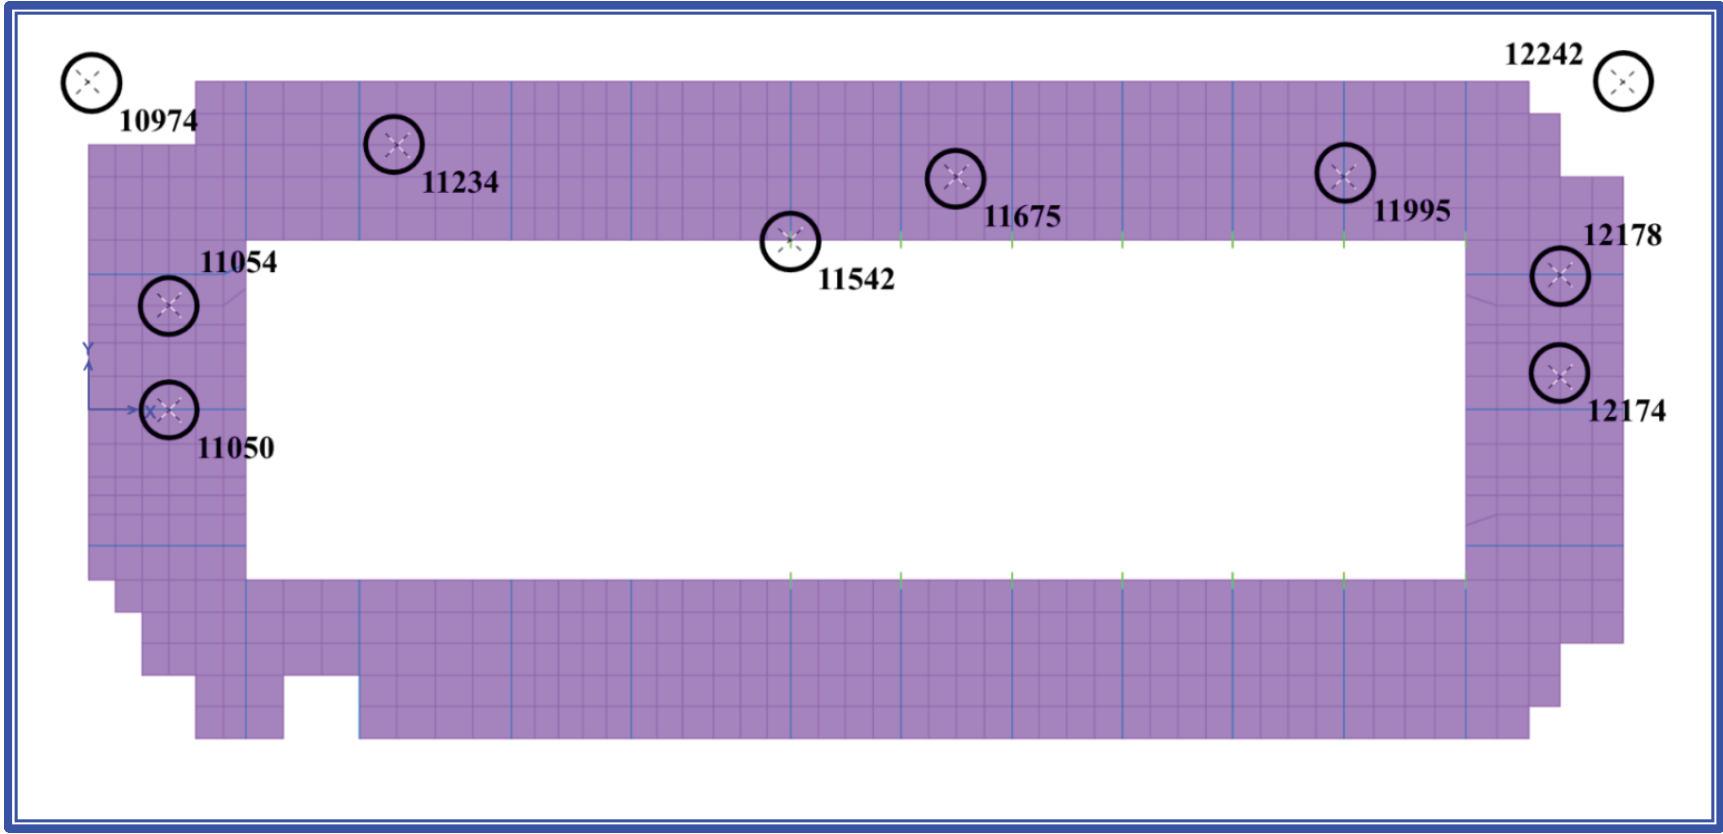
Floor ISRS Locations at TOC EL 75' - 0"
